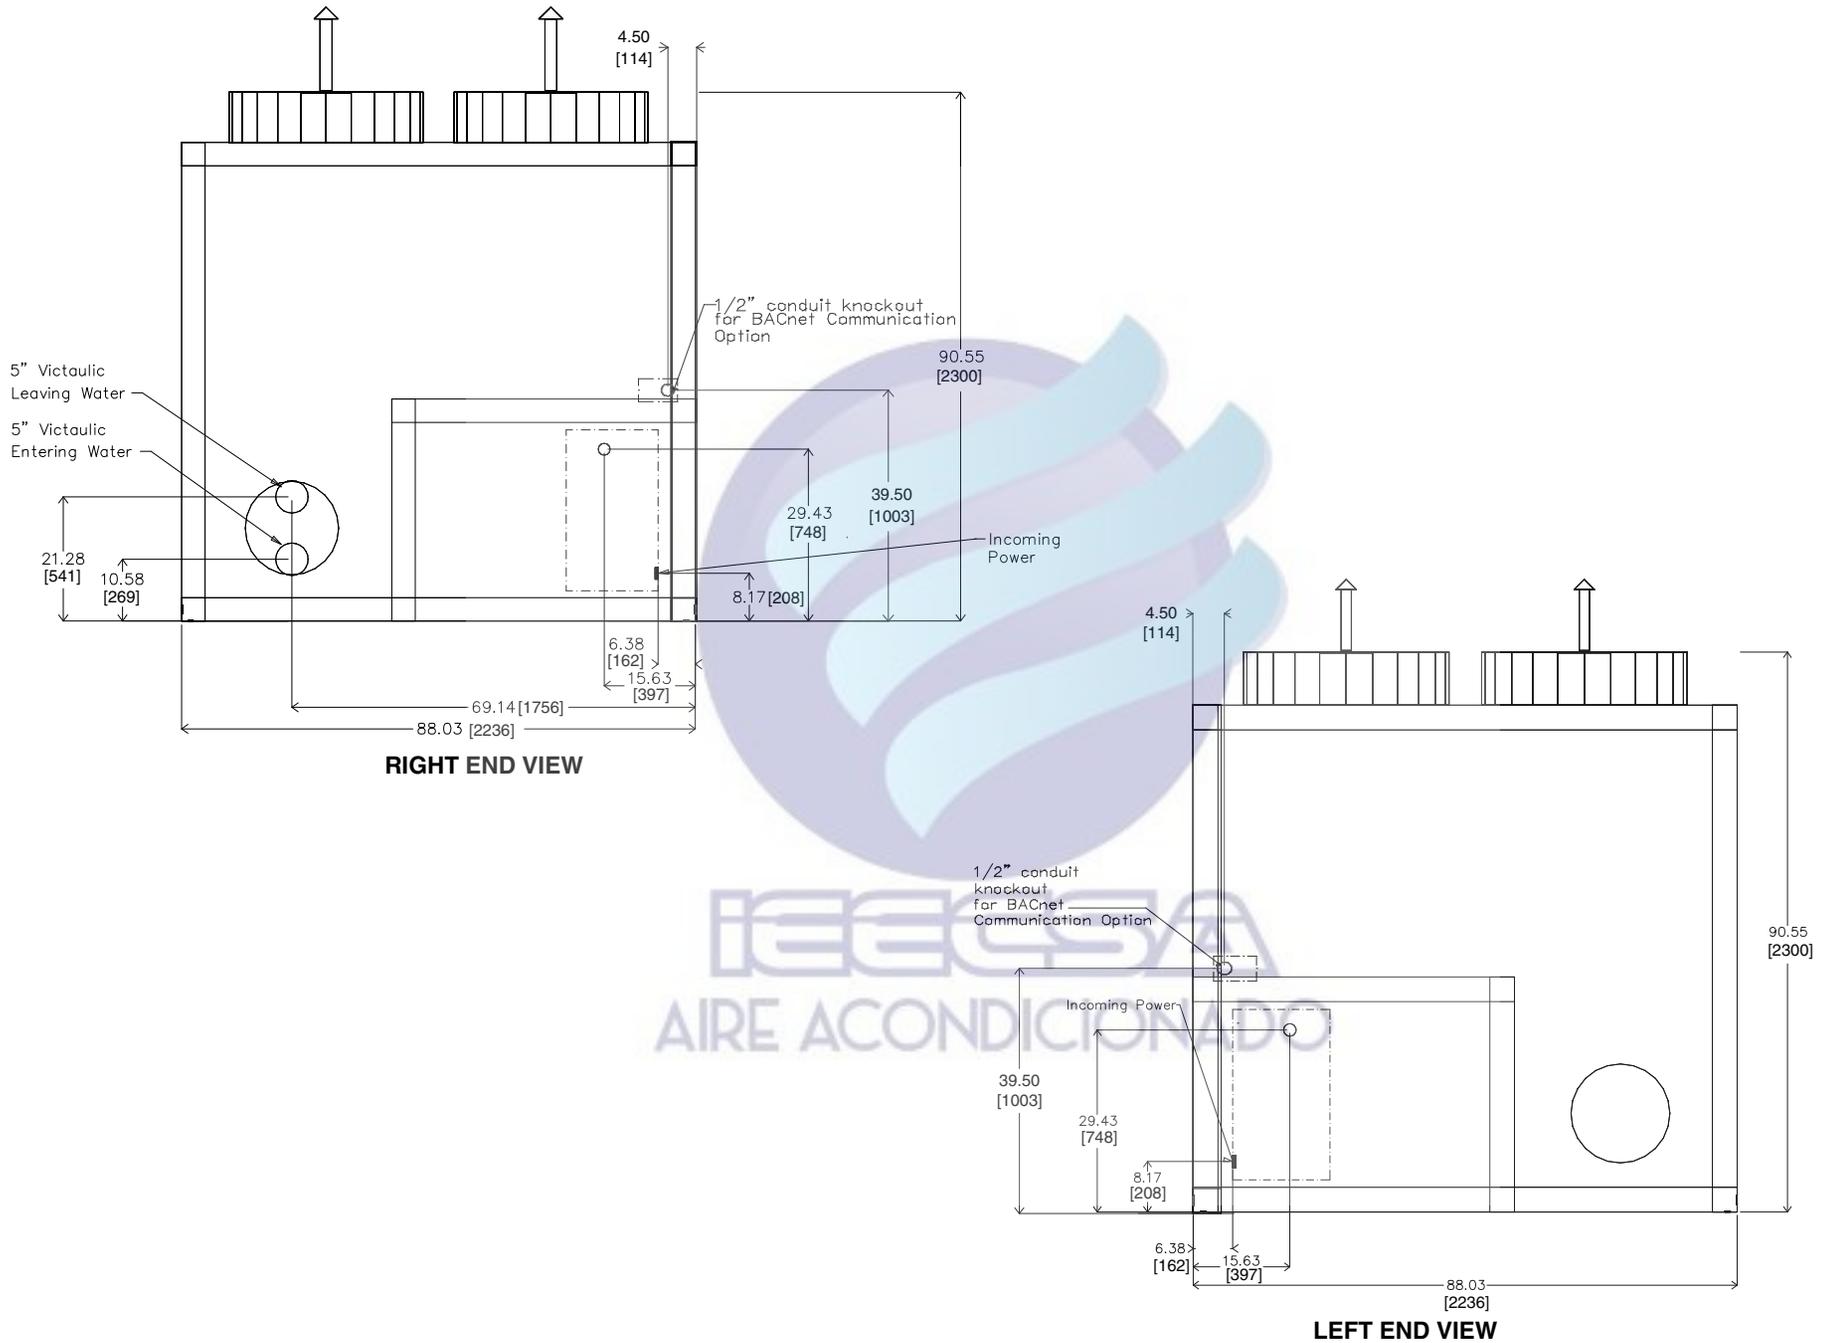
30XA140,160 Air-Cooled Liquid Chiller Dimensions without Pump (cont)
